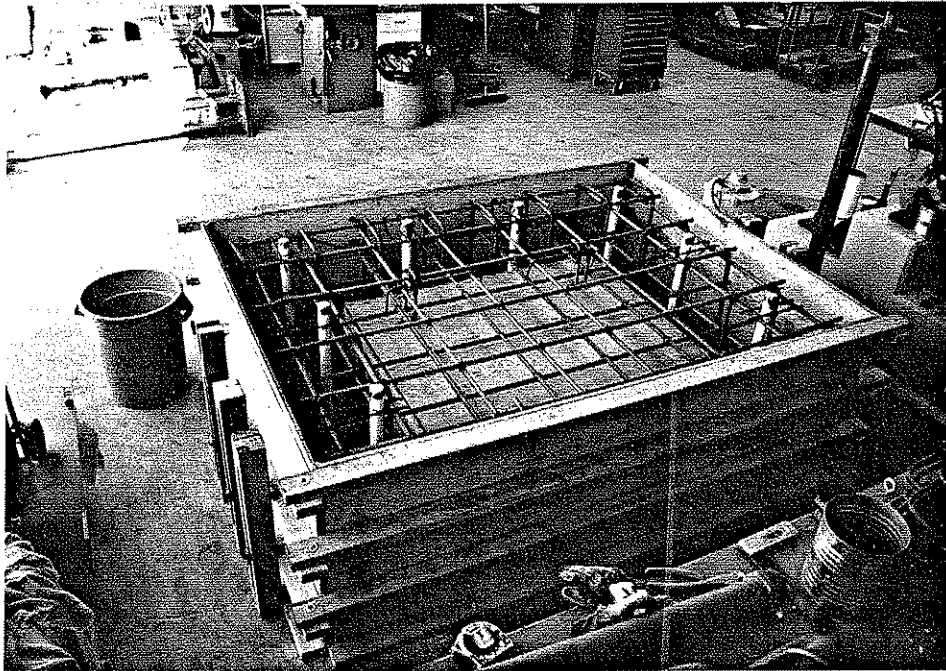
Formwork and steel reinforcement for the guide block prior to casting.
